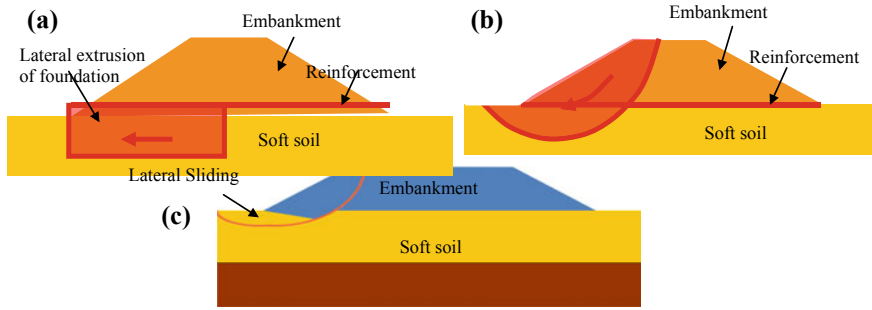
Mechanism of failures in embankment on soft soil a foundation extrusion failure, b rotational stability failure, c lateral sliding failure
